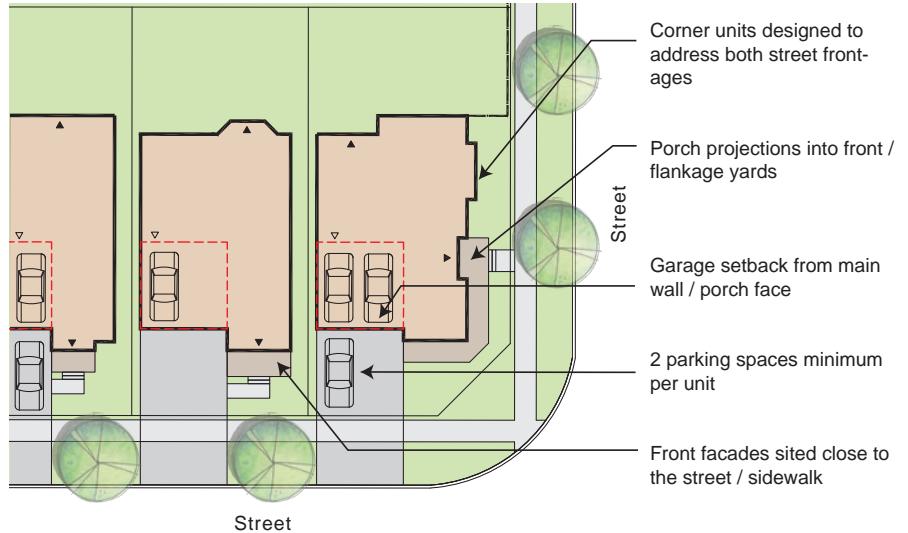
Conceptual plan layout for single detached dwellings
